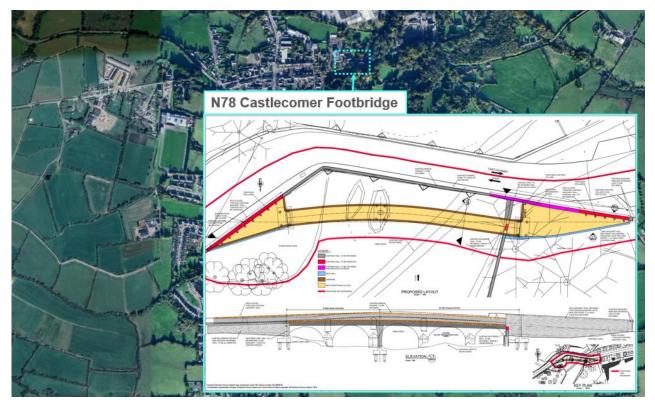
Proposed N78 Castlecomer Footbridge
